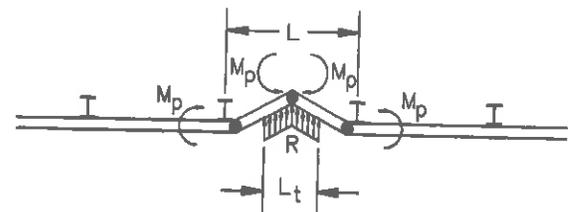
Yield Line Analysis of Concrete Parapet Walls for Impact near End of Wall Segment
